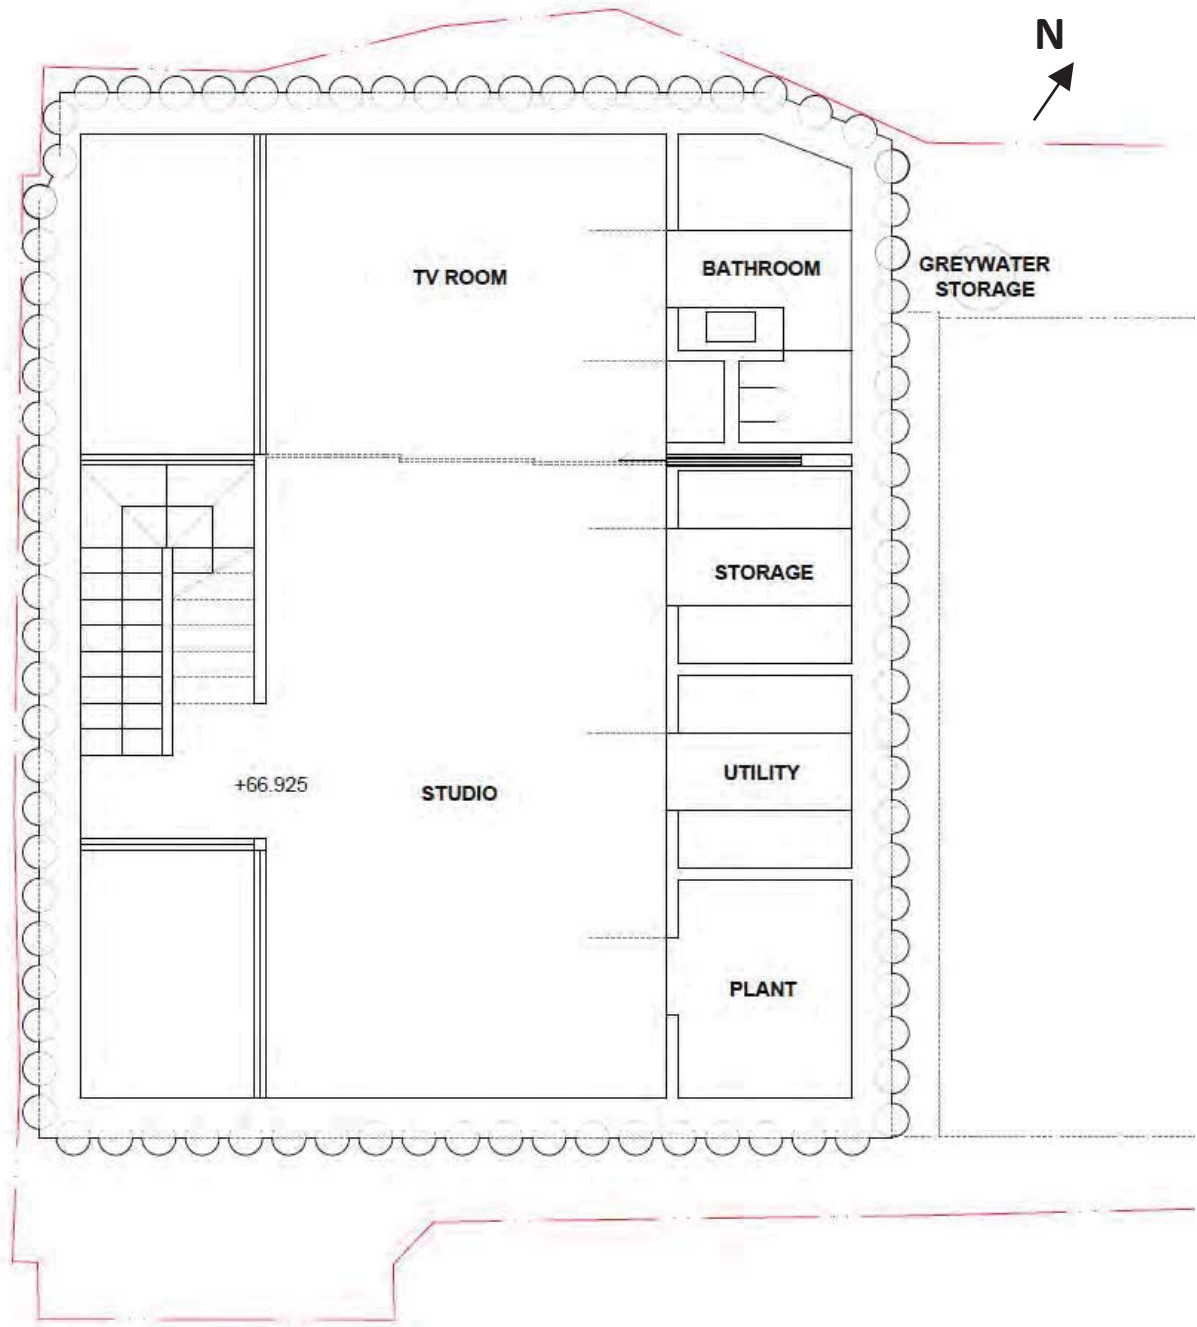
Layout of the proposed basement (Drawing 201_201_P03)
